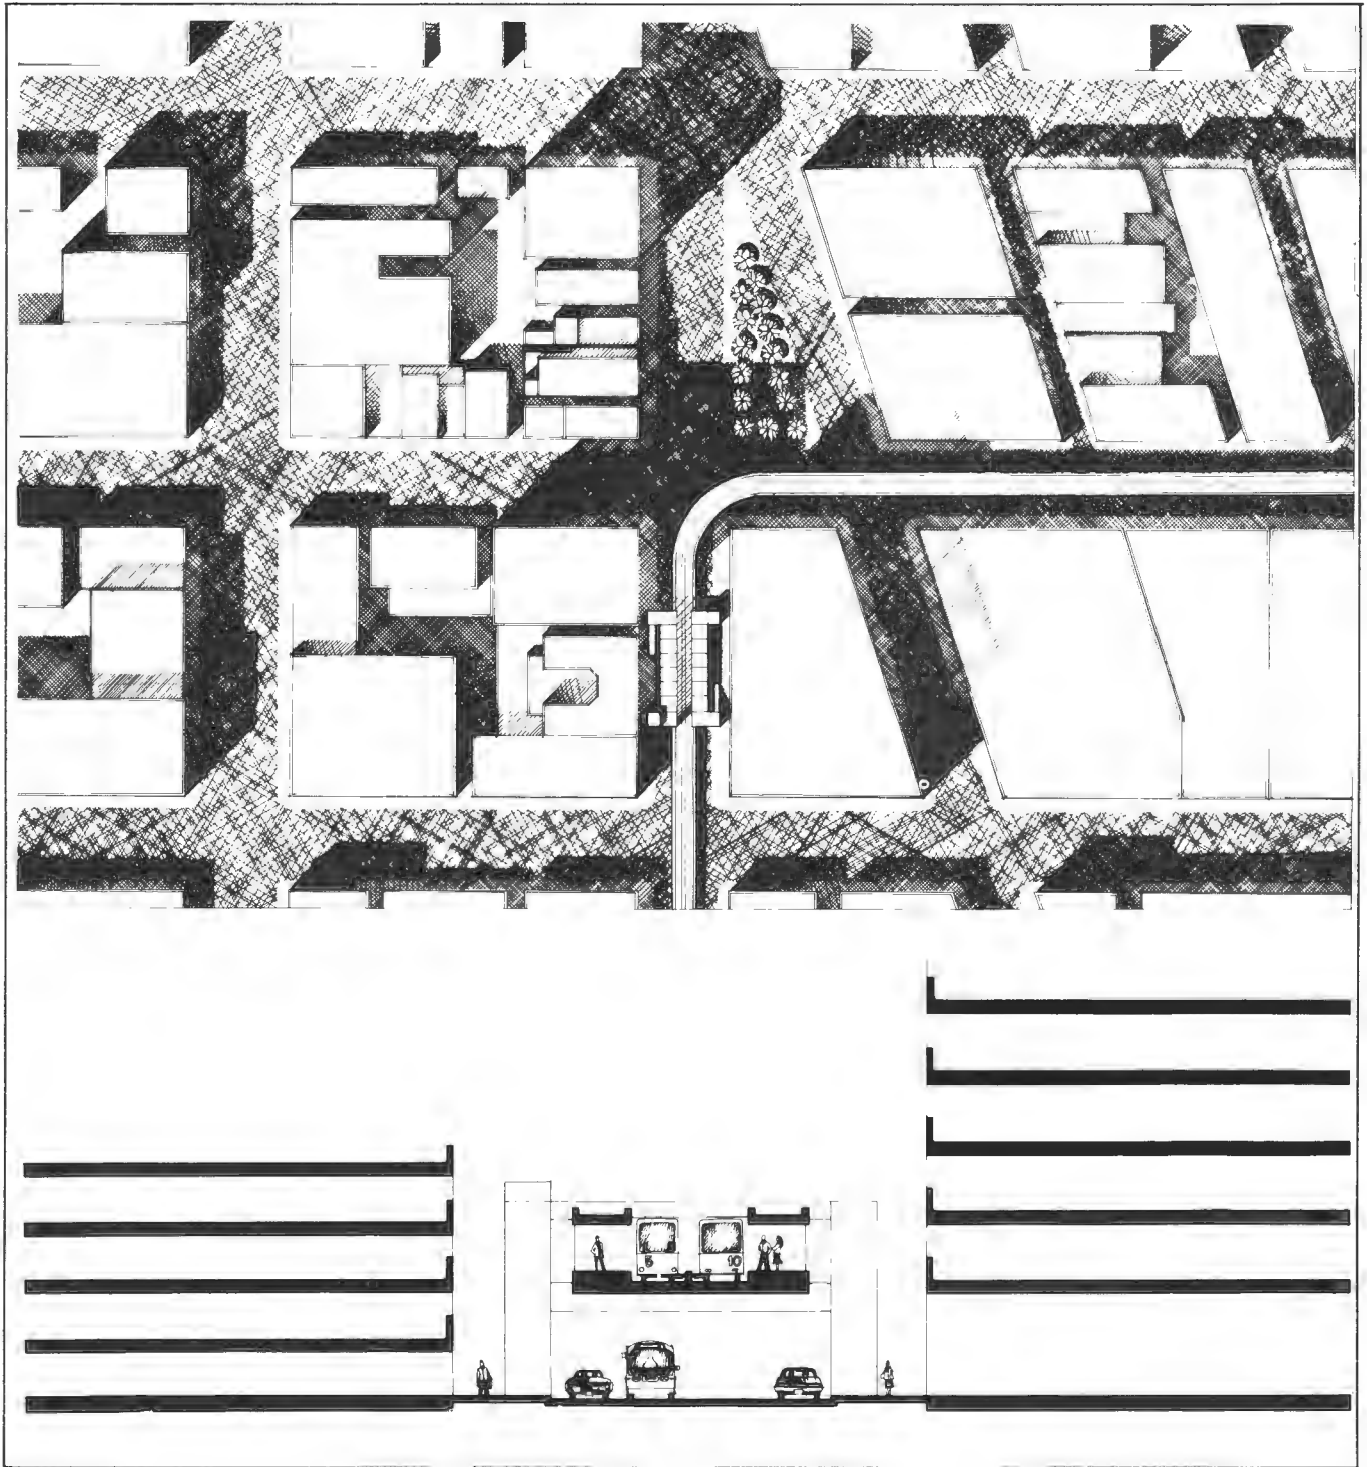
Proposed Station Site at Wabash and Chestnut Streets
